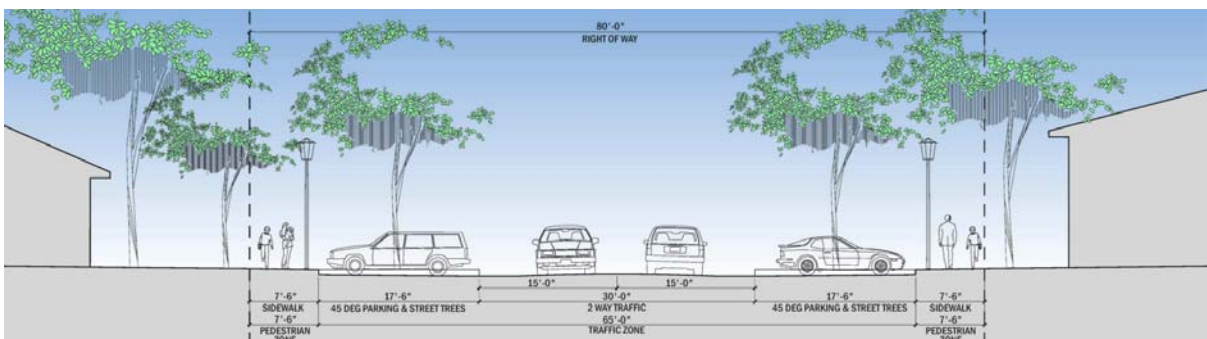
Proposed section, all other Southwest Downtown Plan Area streets
